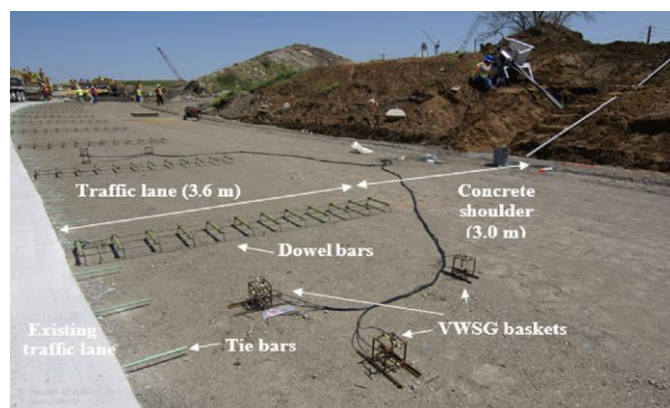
1: A general view of a rigid pavement construction site (after Kujala, 2012).
